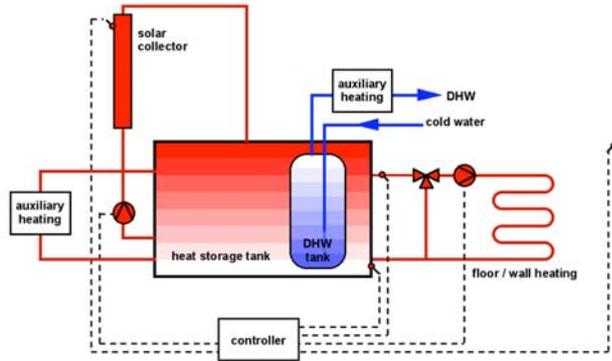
Hydraulic scheme of a solar heating system with drain-back design and polymeric façade collectors.
